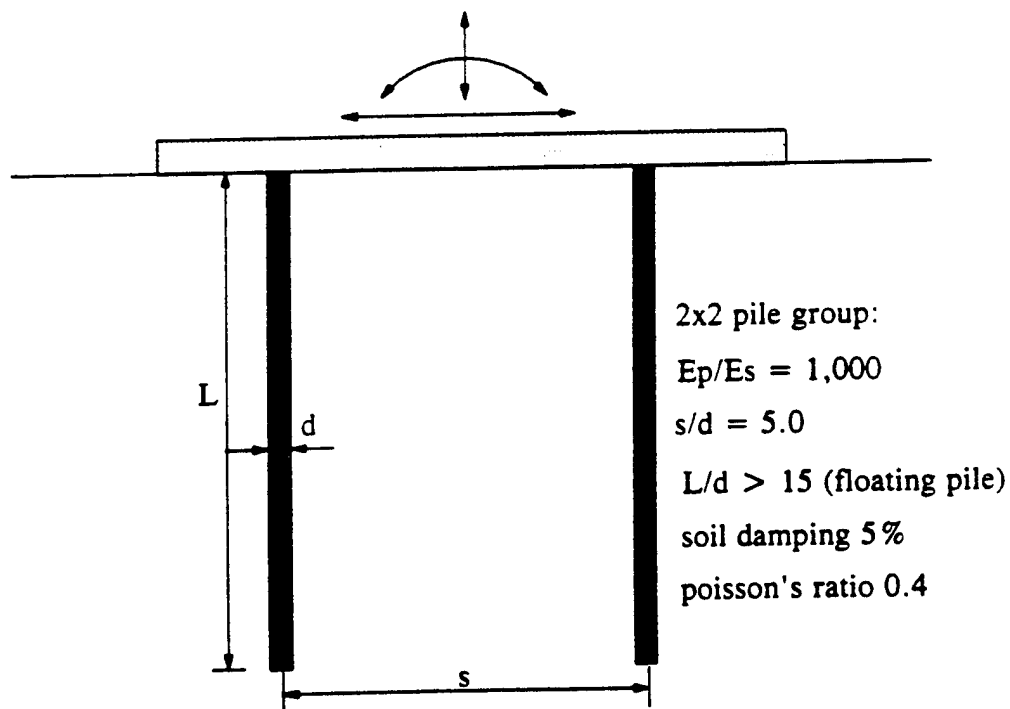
A 2x2 pile foundation with rigid pile cap.
